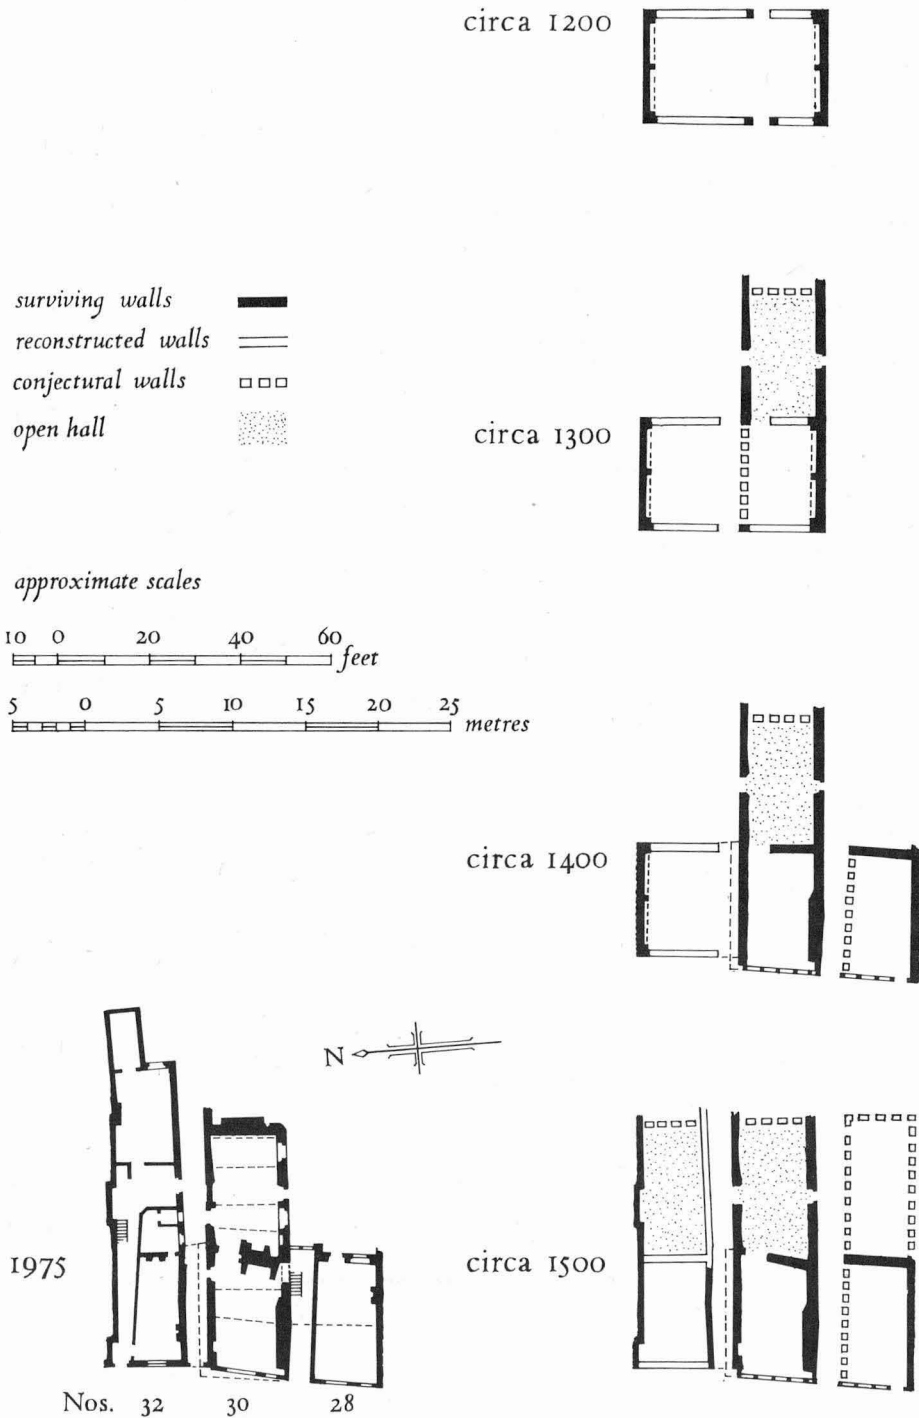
The development of the buildings at 28, 30 and 32 King Street, King's Lynn.
